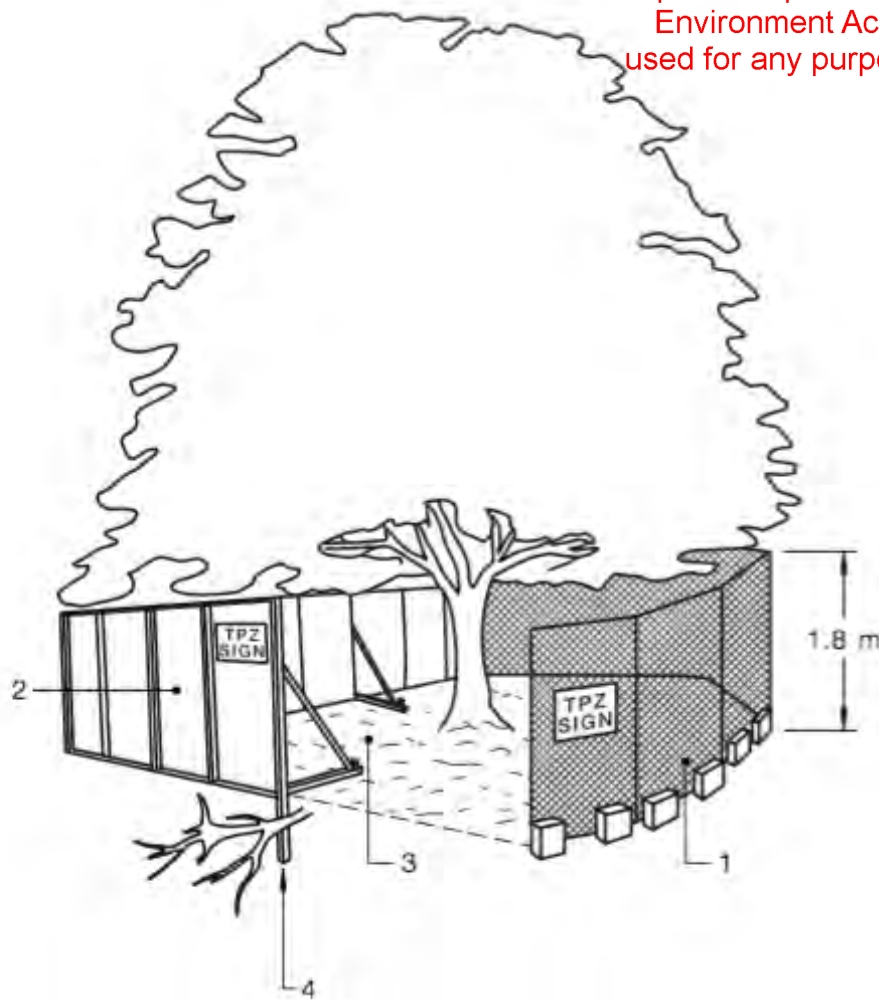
Example tree protection zone with fencing, signage, mulch and bracing (AS4970-2009).
